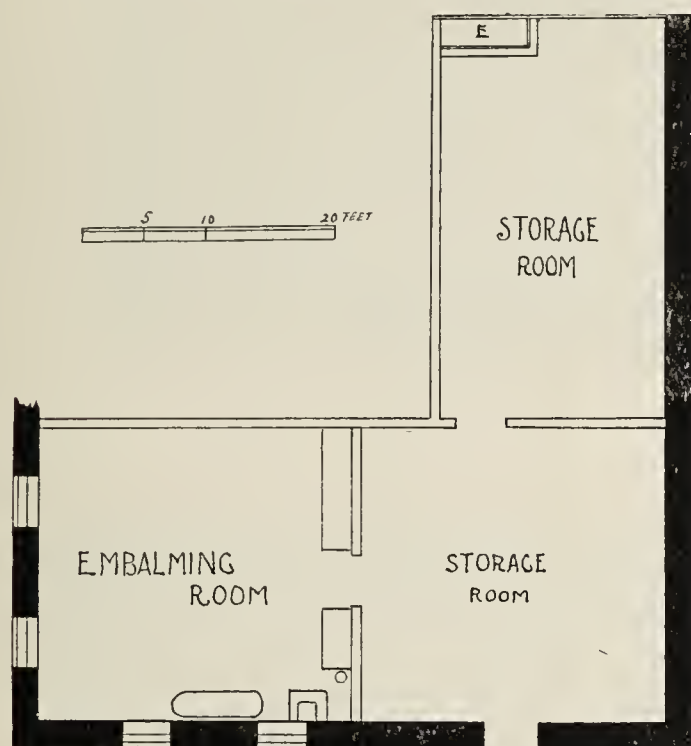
PLAN OF EMBALMING AND STORAGE ROOMS.
